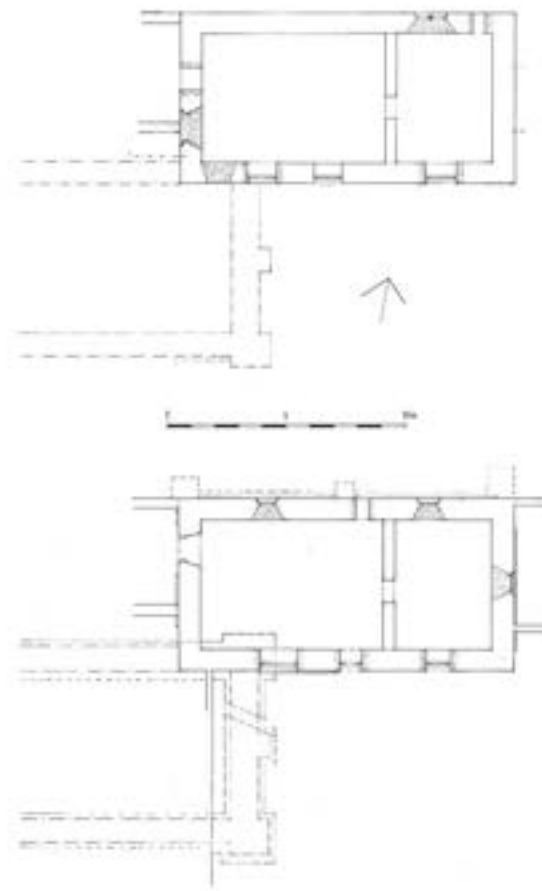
Prior's lodgings, Bewley. Ground floor plan (below), first floor plan (above) (© Martin Roberts)
